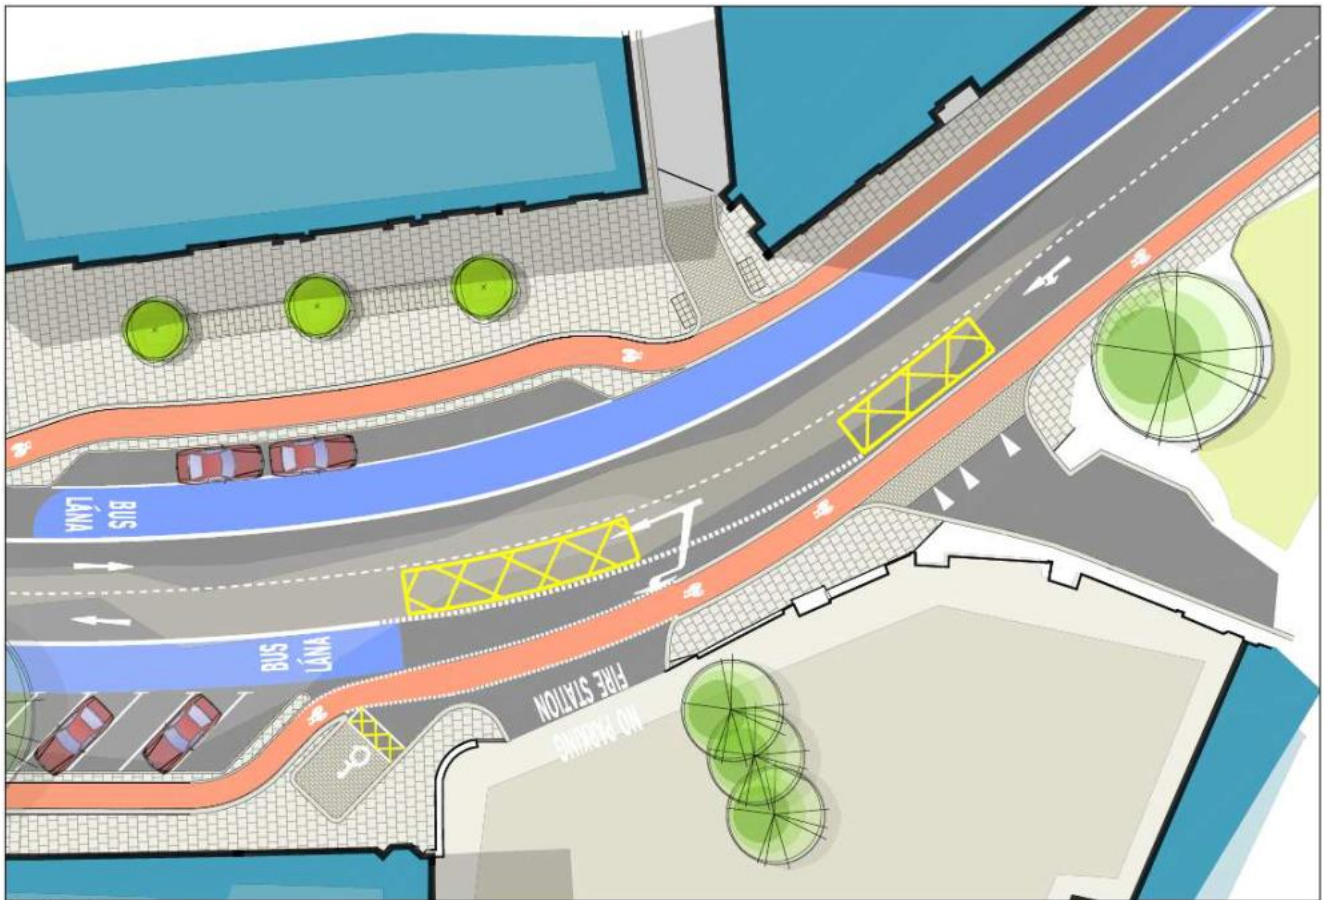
Donnybrook Retail Area, Mulberry Lane
